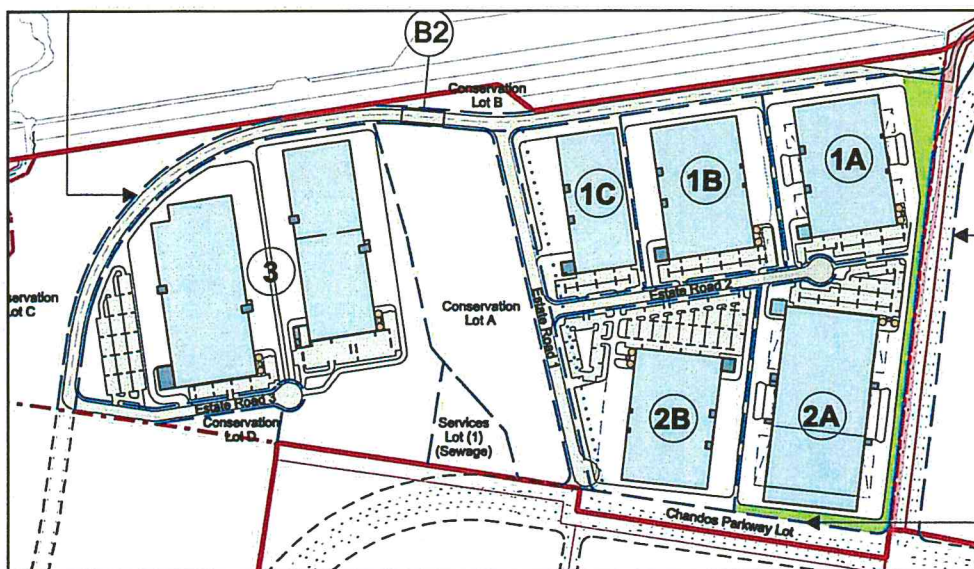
Site layout approved under MP08_0065 & MP06_0066
